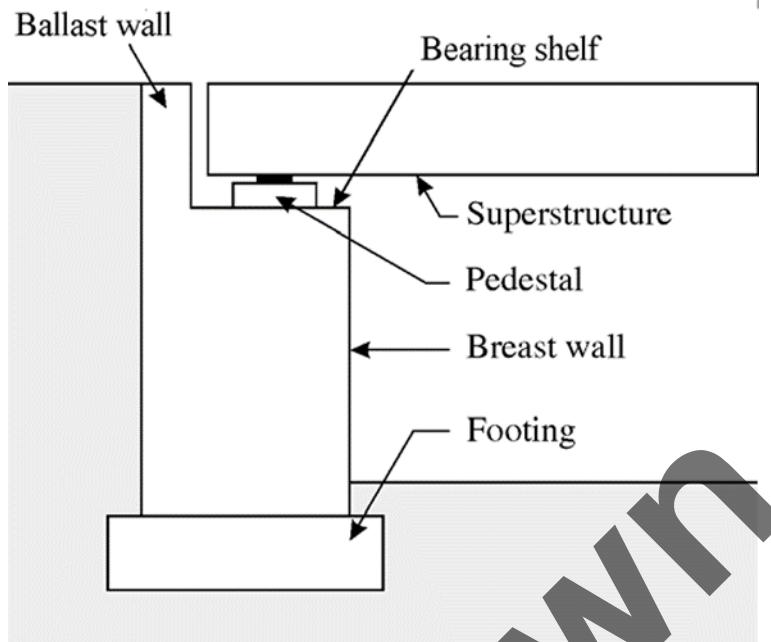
illustrates the different elements of a typical abutment cross-section.
